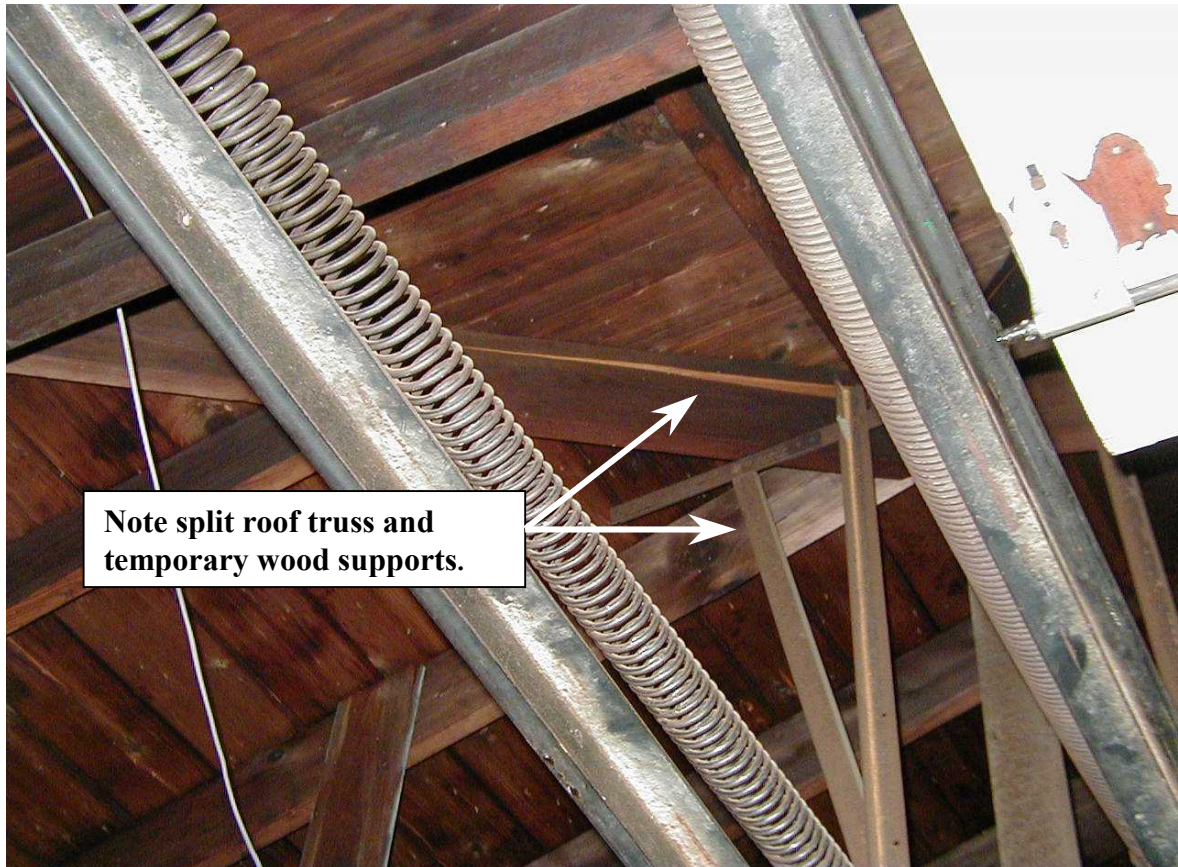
DAMAGED ROOF TRUSS
